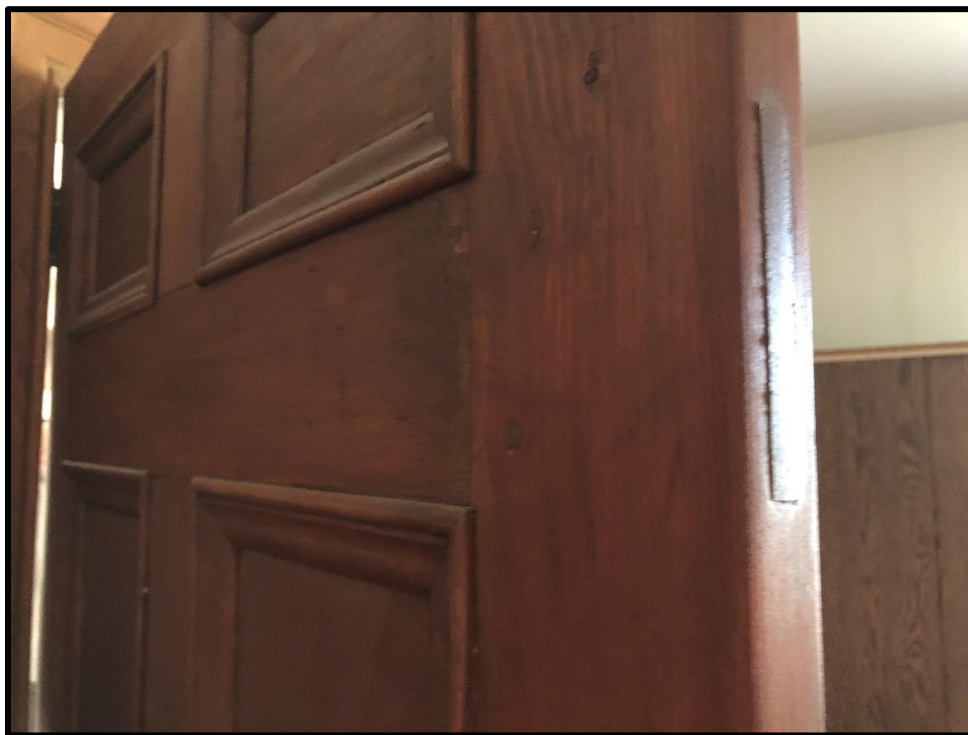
Mortice and Tenon Joinery with Through Tenons Visible on Interior Doors
